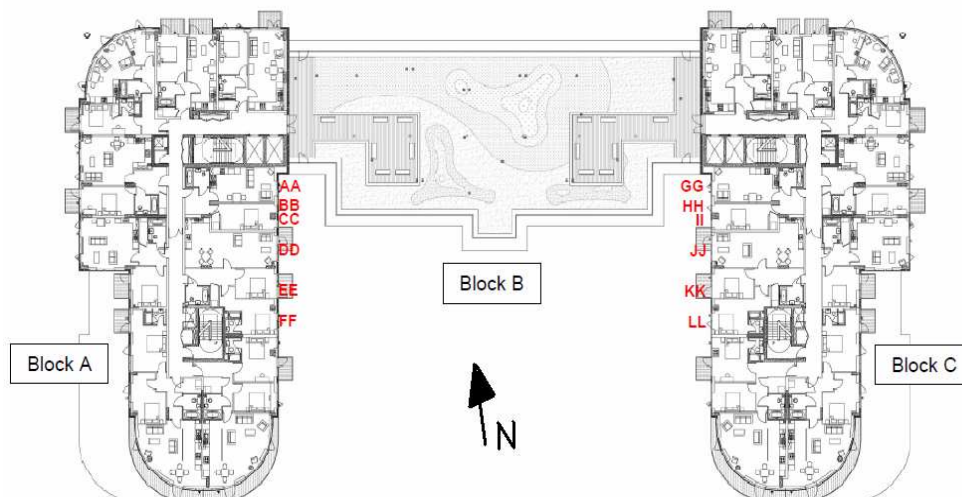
Plan of existing 14th floor, based on plan provided by BUJ Architects. This layout is replicated on the 15th floor. The blocks and the window positions analysed have been labelled.
